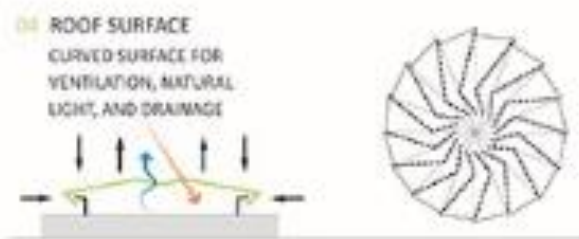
Roof Structure and Ventilation of KSPO Dome Arena
